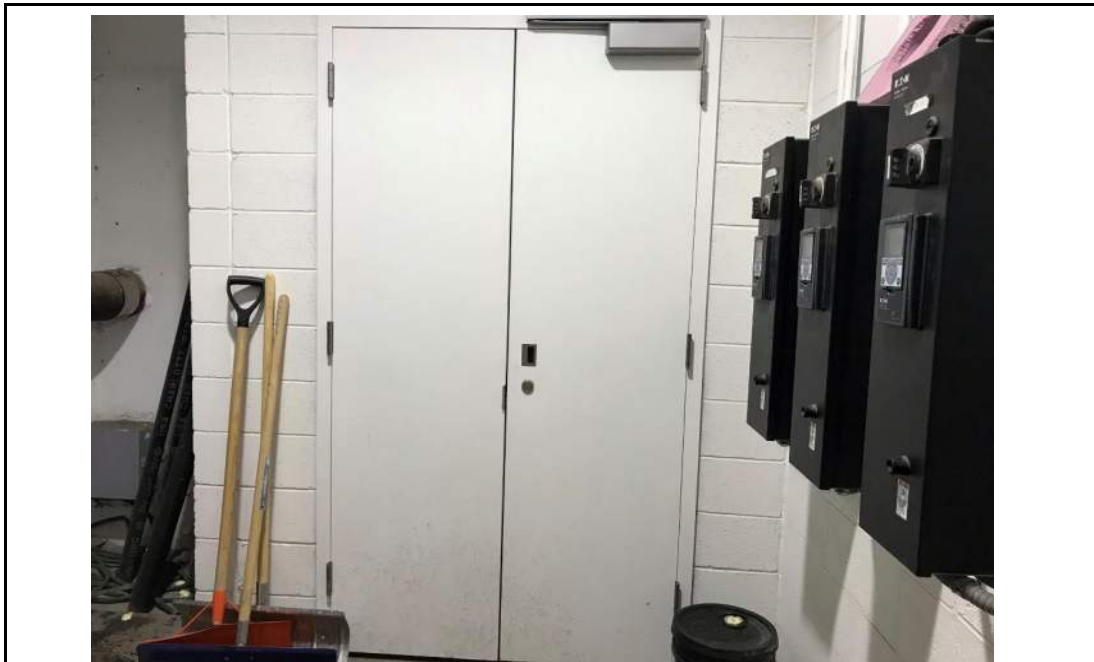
Air Sparge/Soil Vapor Extraction (AS/SVE) manifold closet within subgrade parking area, facing west. 21 April 2021.
